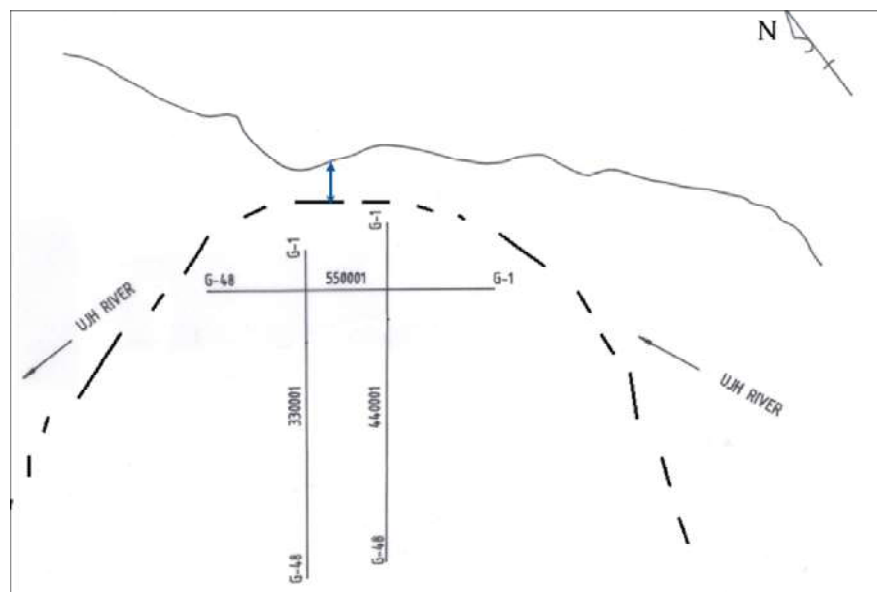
Layout plan of seismic profile lines at Ujh barrage project, J&K
